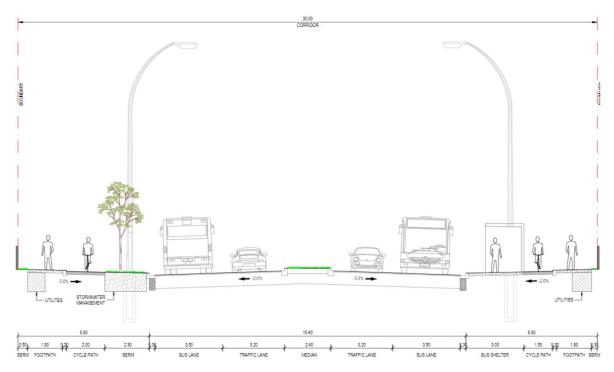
Ōpāheke North-South typical cross section (indicative)
